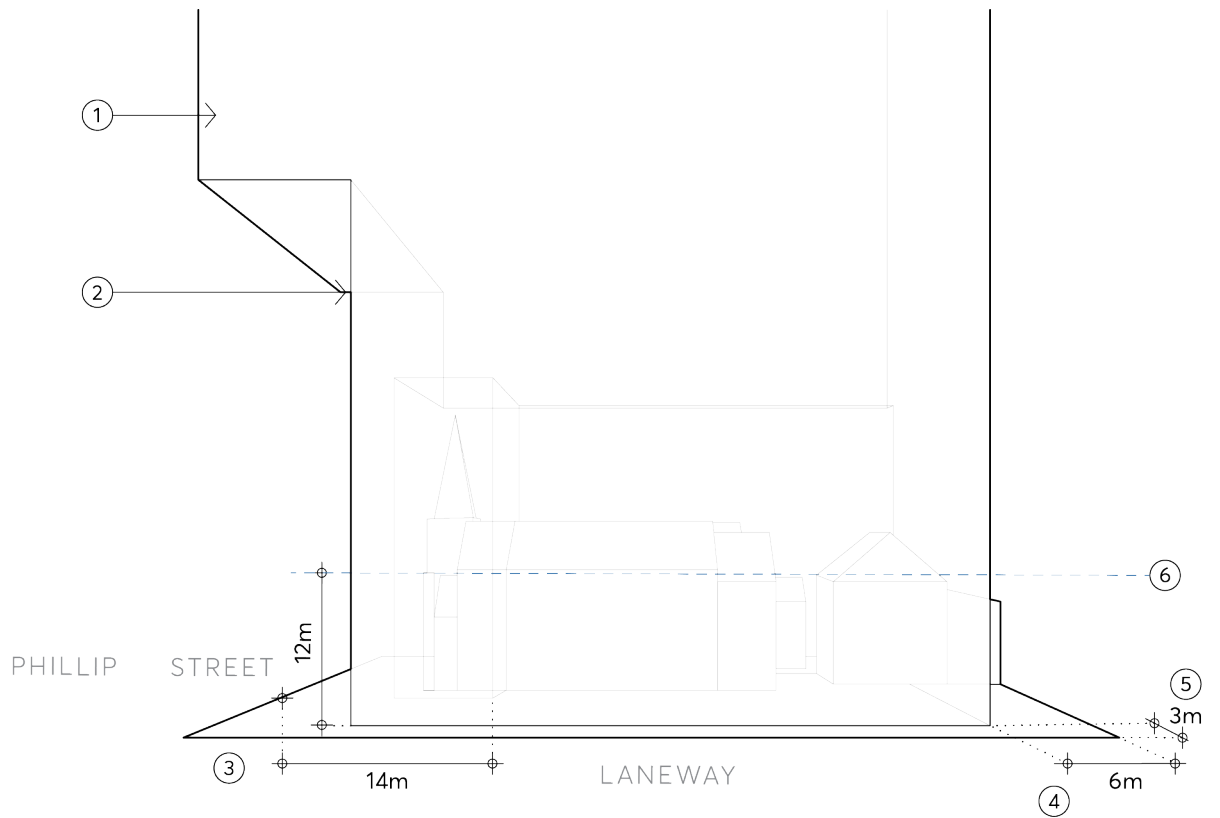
Maximum building envelope – Ground plane from Marsden Street NTS (Source: TKD Architects)
